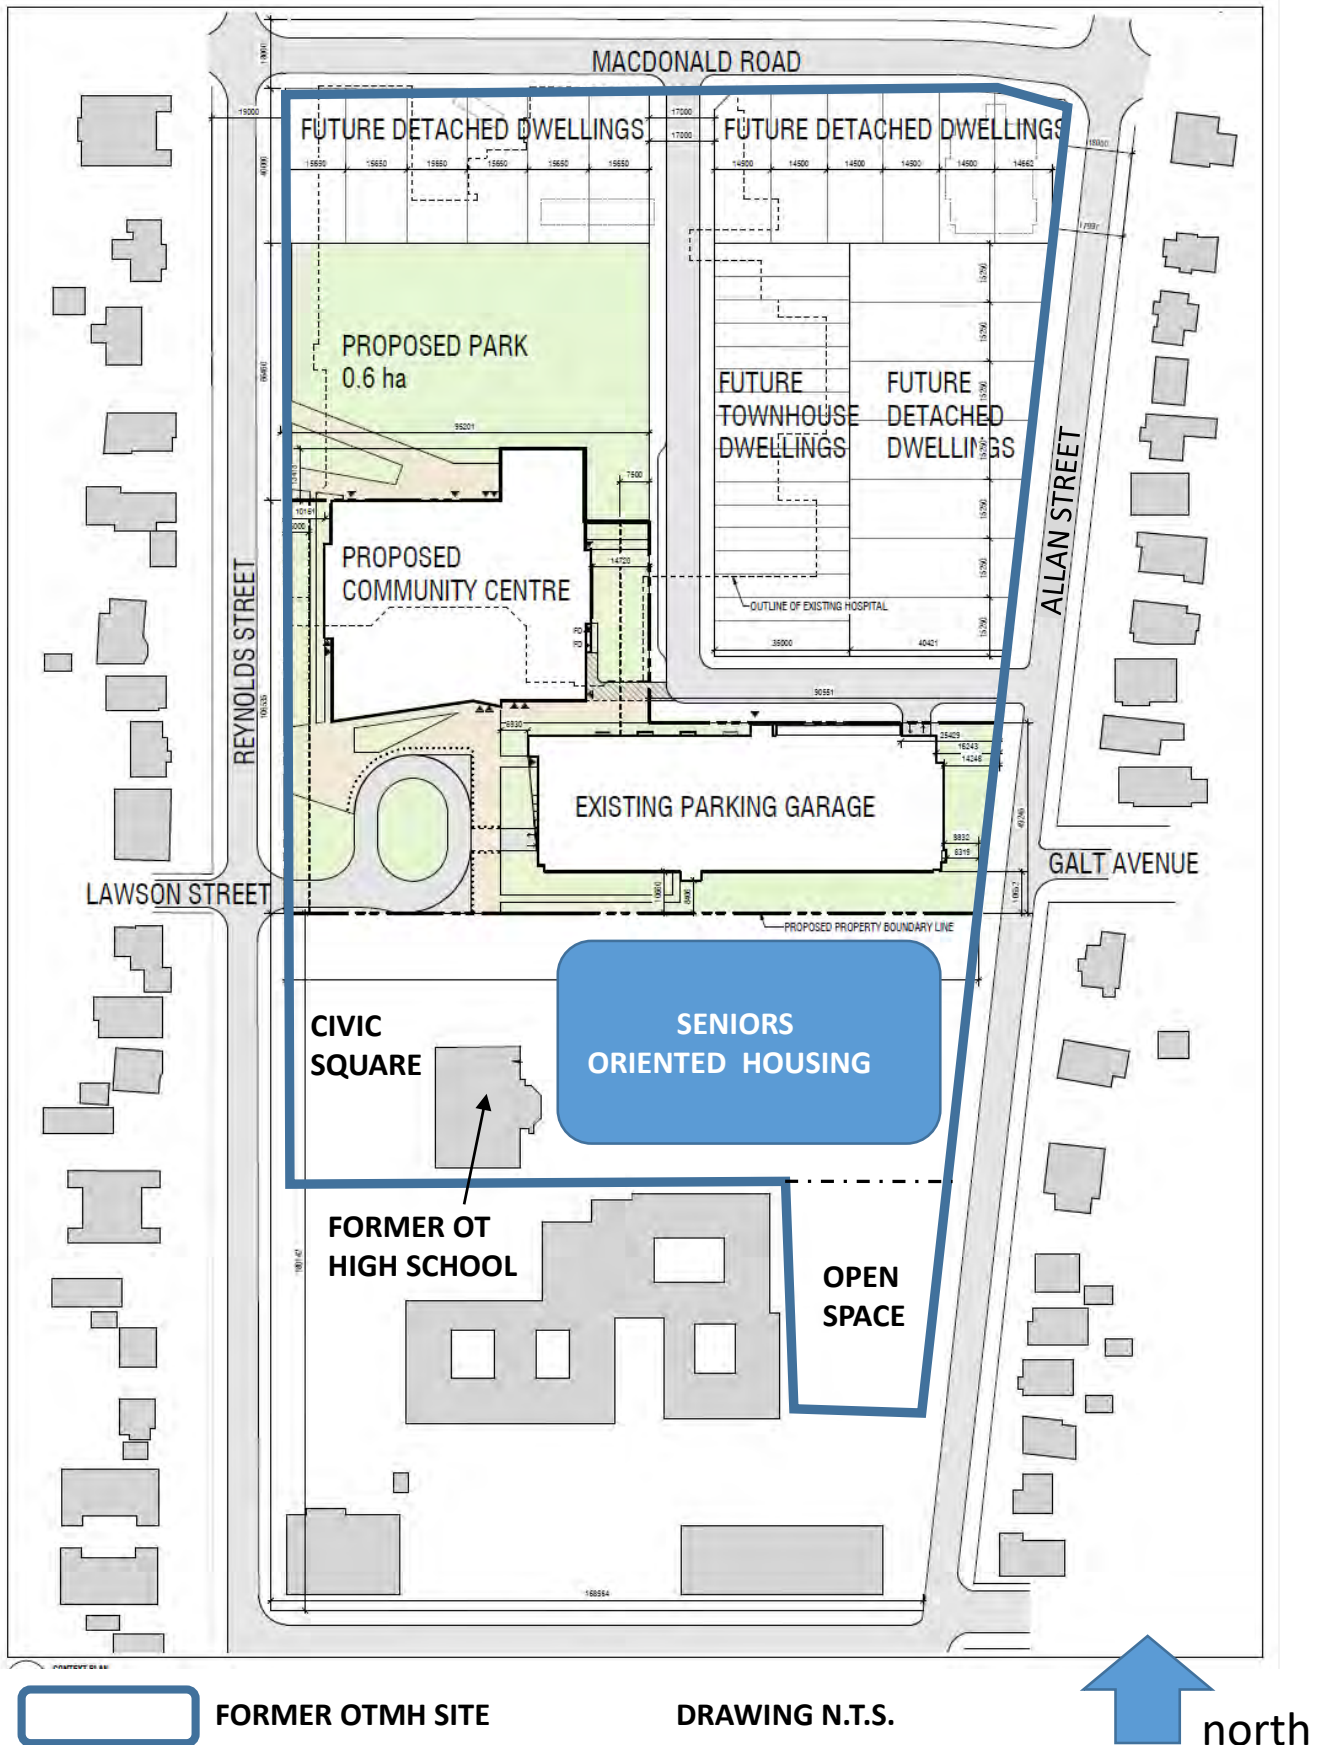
OHMT Draft Development Concept Plan, 2018 (Town of Oakville)
